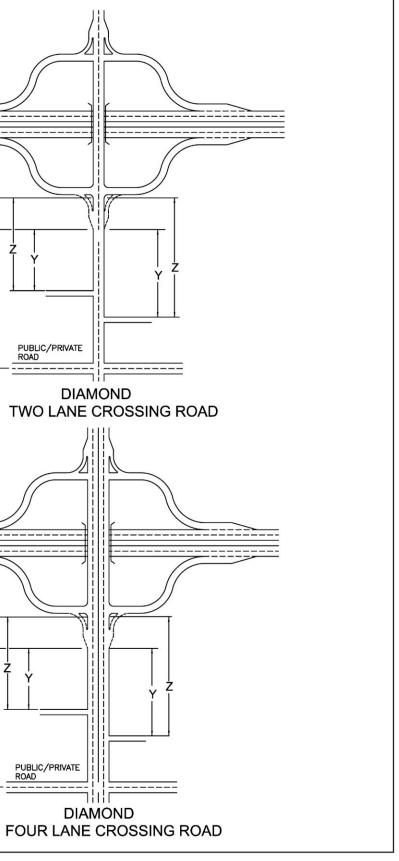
Functional Intersection Area - Desirable Offset Spacing Criteria – Public Road and Medium / High Volume Commercial / Private Road Access Connections
